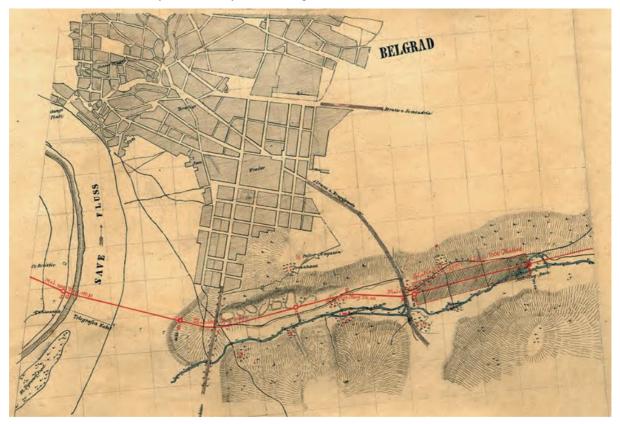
Plan for railway construction on the place of urban highway, 19th century Source: Злата Вуксановић-Мацура, 'Бара Венеција и Савамала — железница и град' Наслеђе 16 (2015) р. 10.
